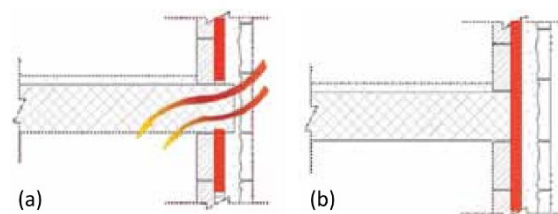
A thermal bridge, here in a floor-wall connection, can cause considerable heat or cold loss and reduce the effectiveness of wall and roof insulation (a). Closing the insulating layer removes the thermal bridge (b)
